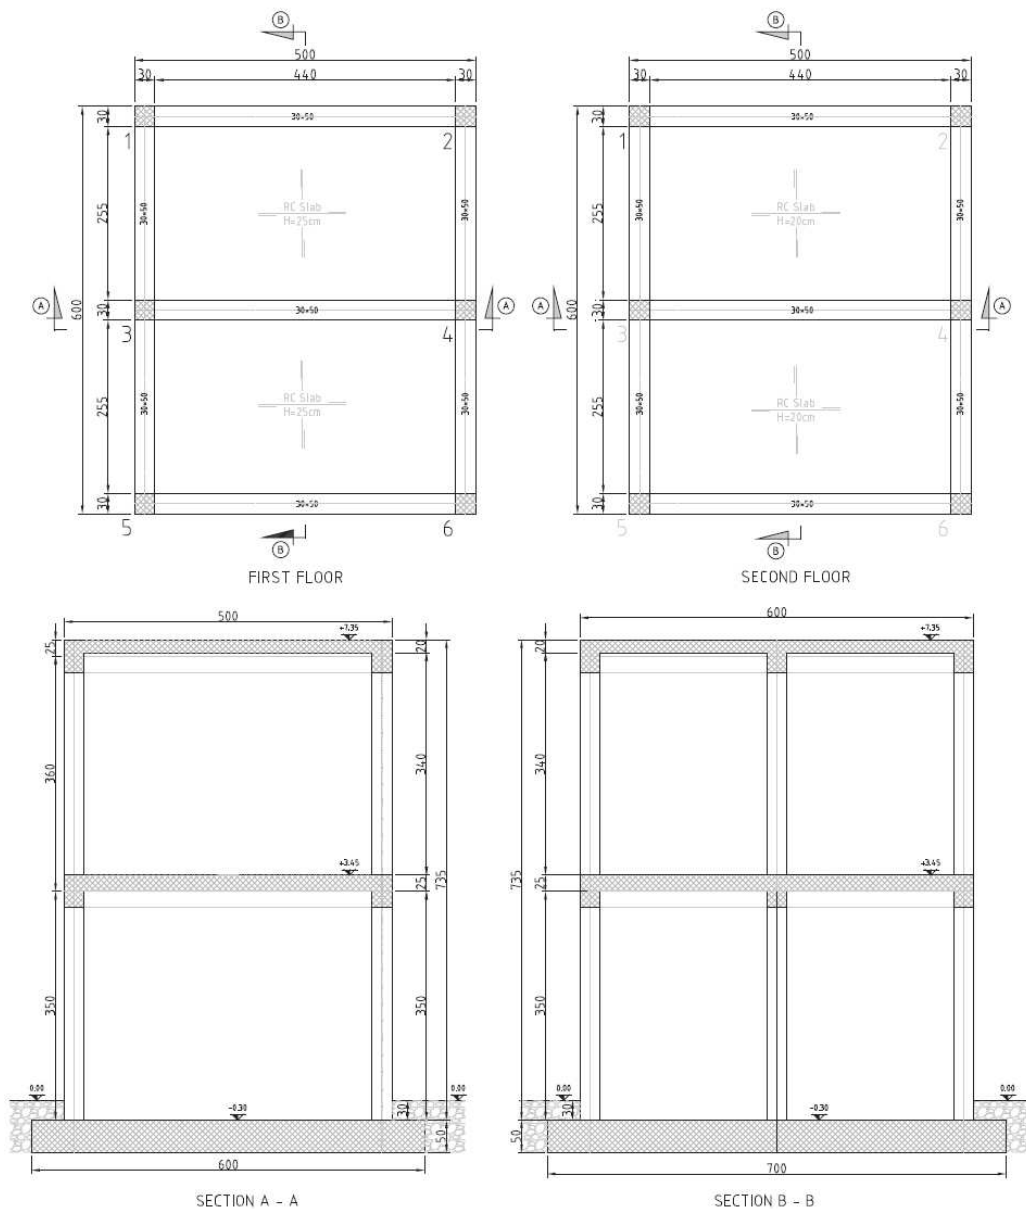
Floor plans and cross sections of the RC test frames [10]
